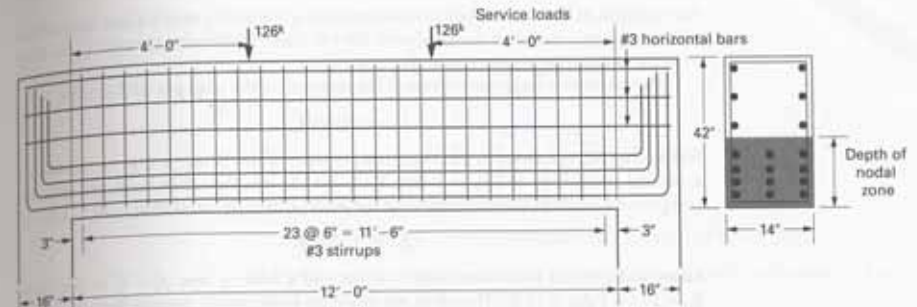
(a) Example 5.15.1: (a) beam details.
